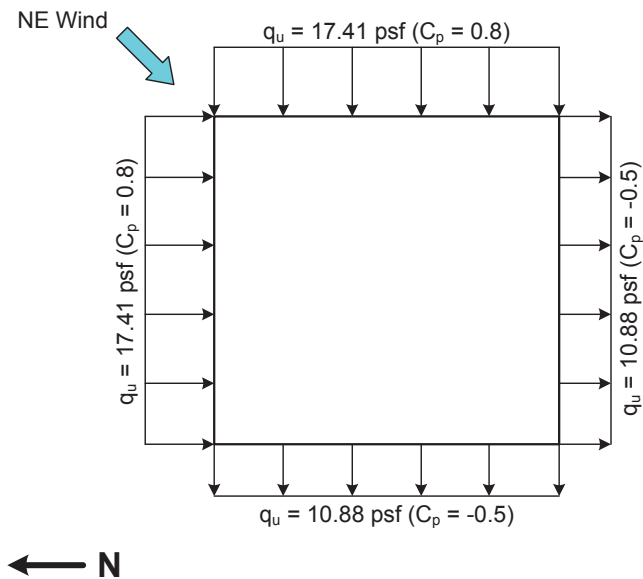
Case 5 - Wind Loads applied to walls due to northeast wind.
